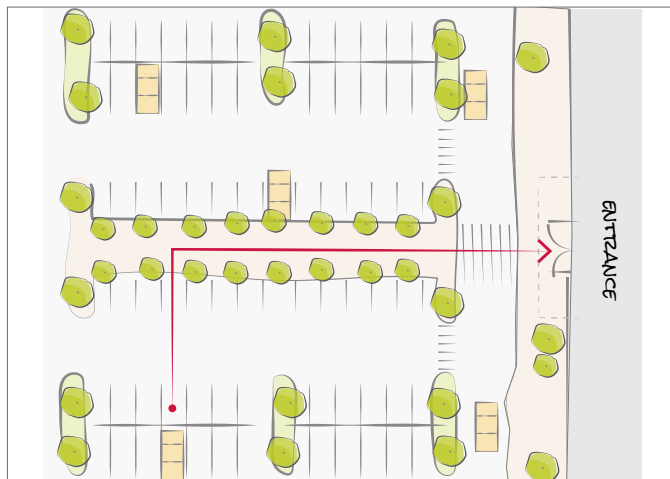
Example of parking modules defined by landscaped islands and pedestrian paths oriented toward building entrances (6.1.2 g).
